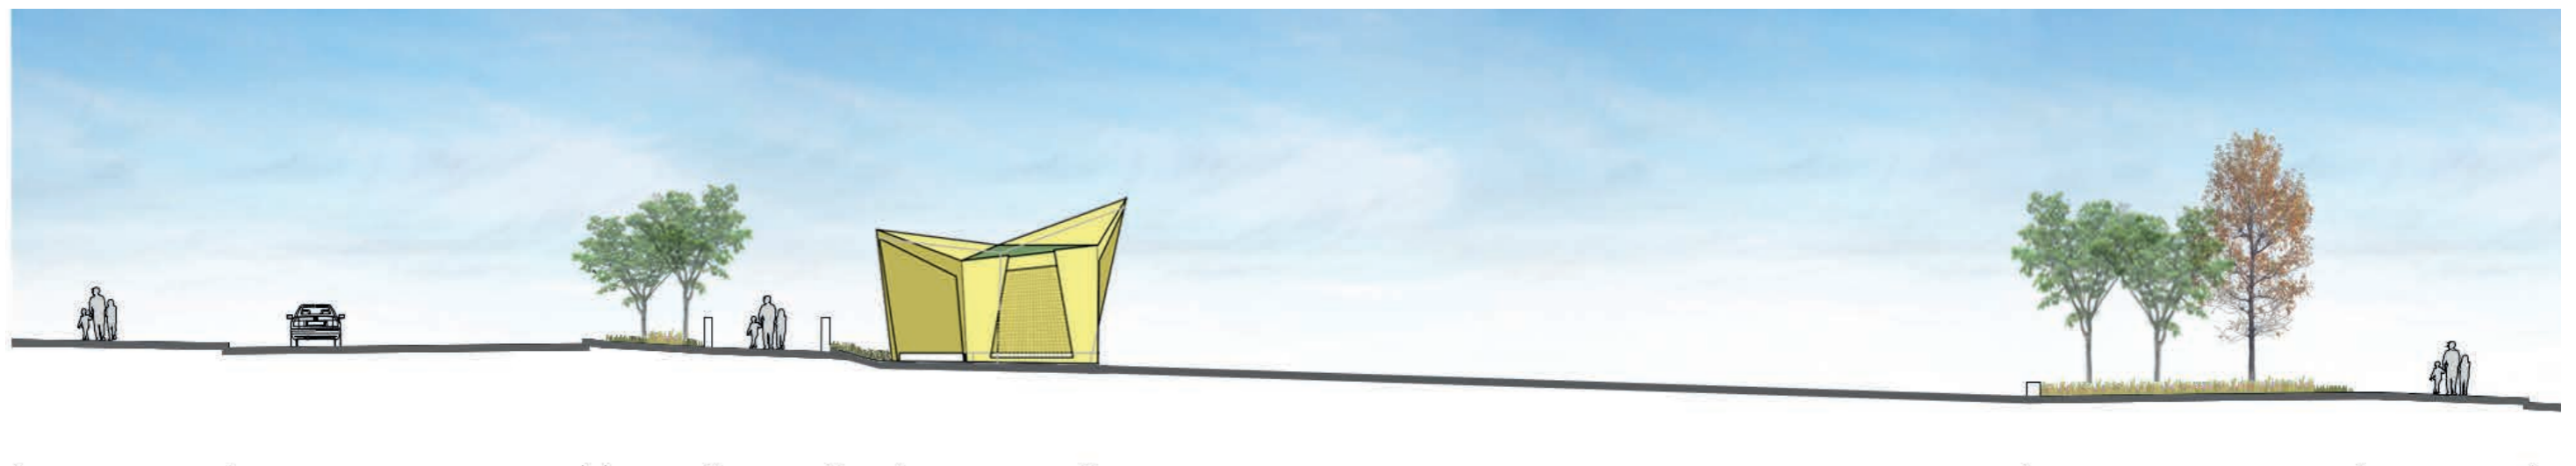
Cross Section A-A through A803 Kirkintilloch Road and the Civic Space
